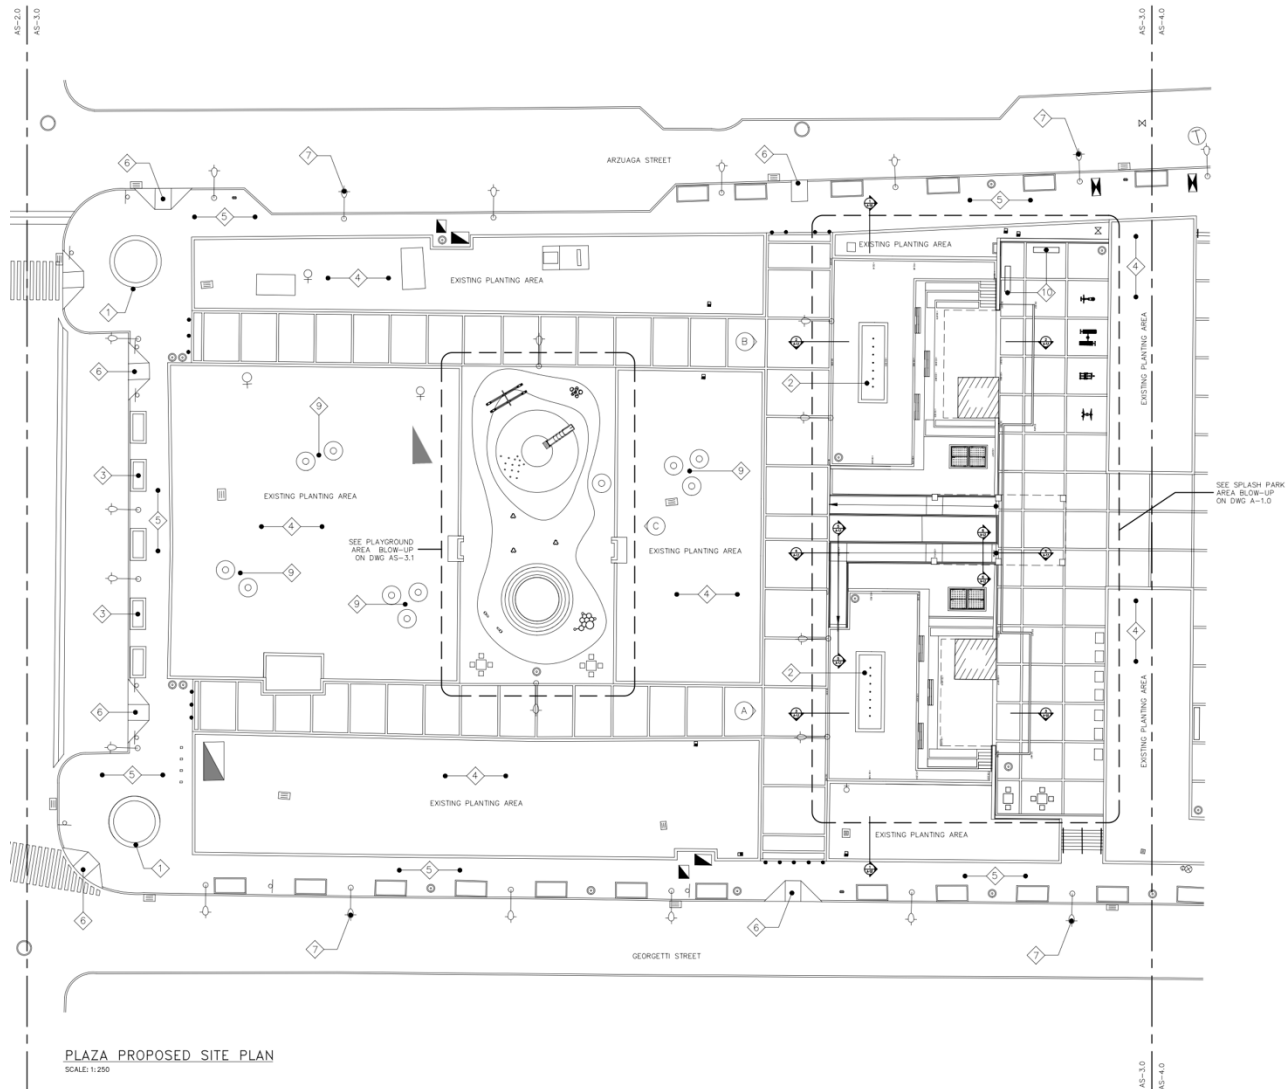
Proposed site plan for the west half of Plaza de la Convalecencia (Source: Drawing AS-3.0, Hernández-Bauzá PSC Architects, 2024).
